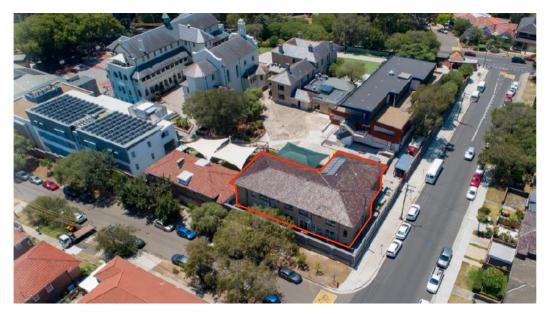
Aerial view of south-western corner of the site, existing Adler Building identified in red (Source: City Plan).
